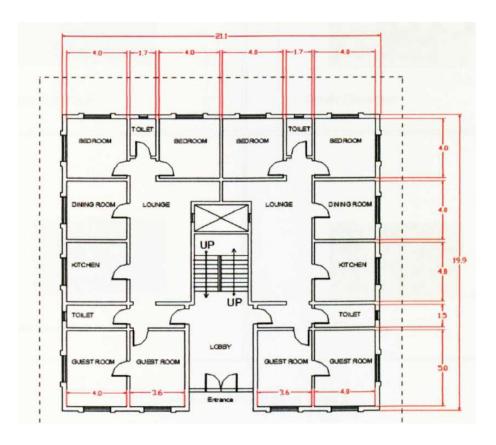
Typical floor plan including two apartments (Taleb, 2011)
